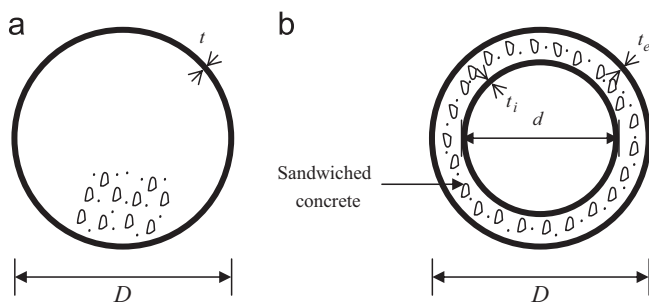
Types of circular concrete-filled tubular stub columns. (a) CFST or CFSST and (b) CFDST
